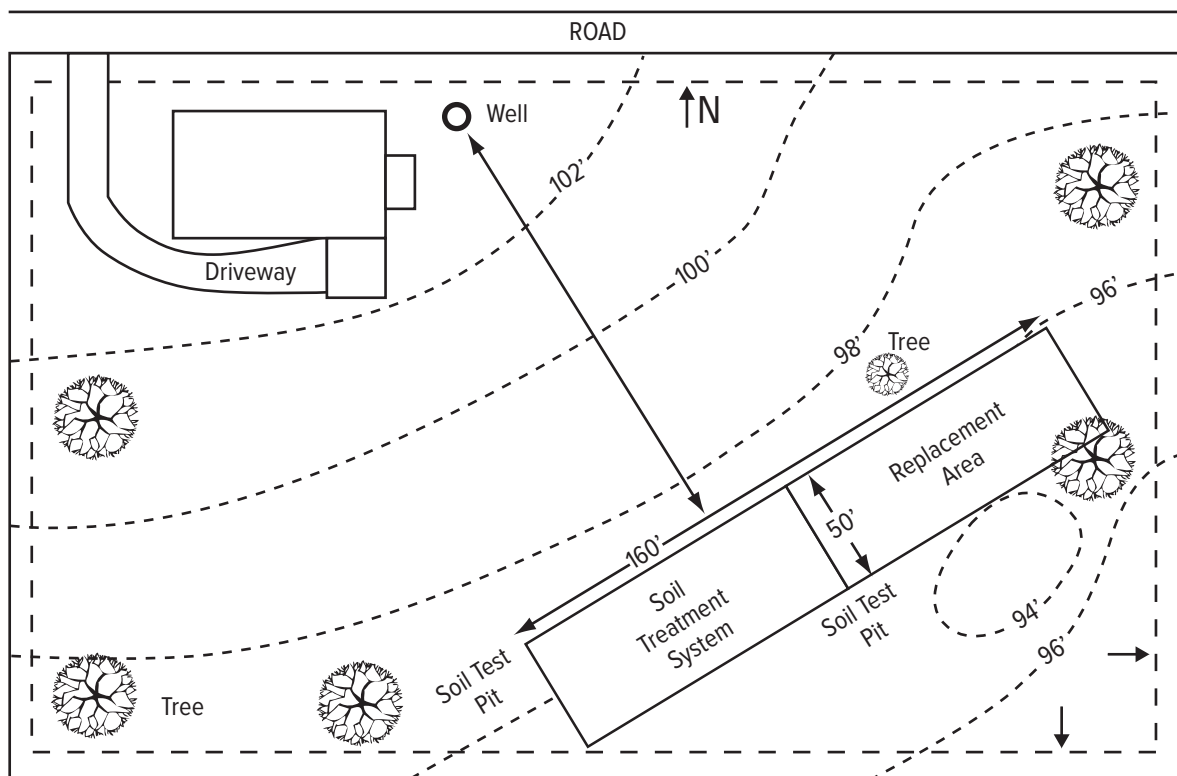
Draft of layout plan with site of proposed soil treatment system.
